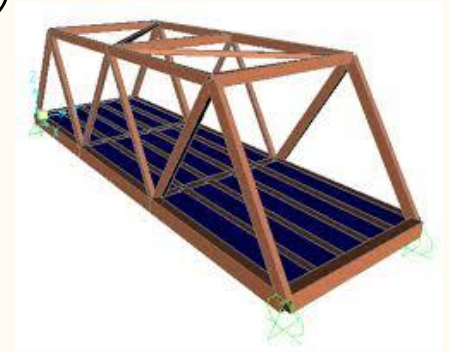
shows a Bridge using the Warren Truss Design (Source: Herbudiman, B., et al. 5)
